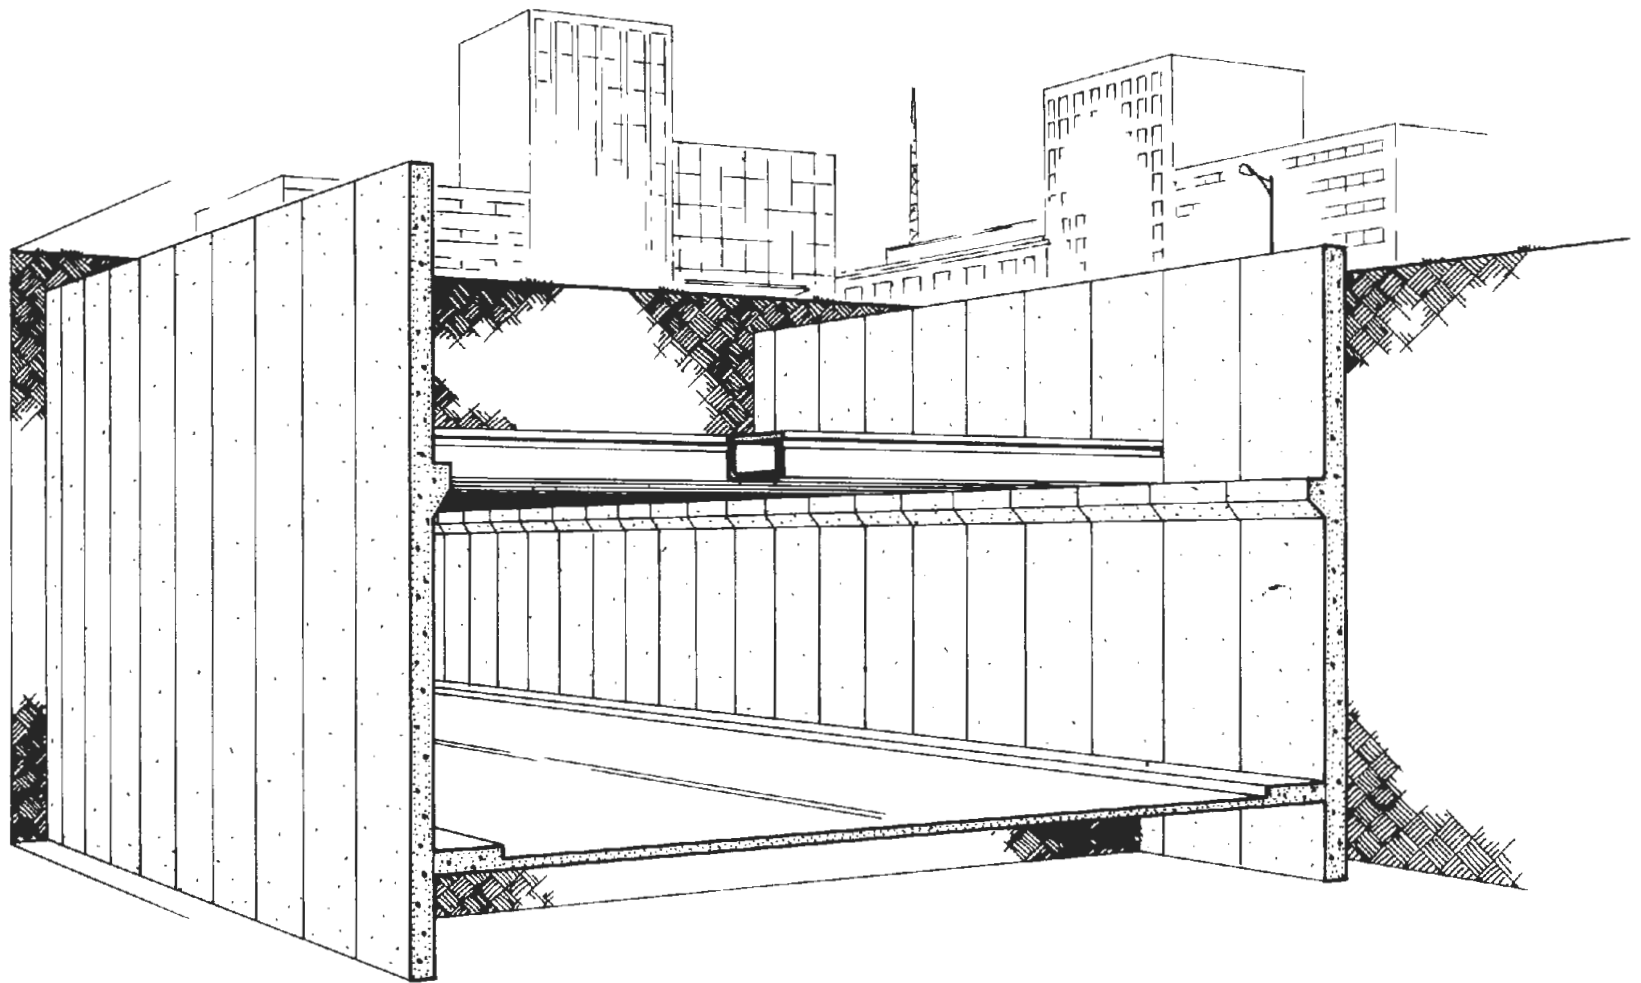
Continuous precast concrete bearing walls with box girder tunnel roof.
